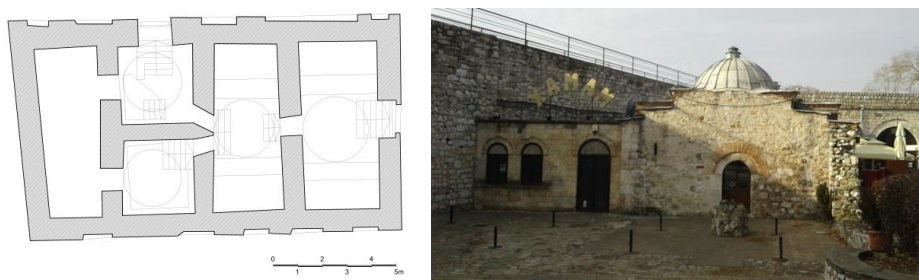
Floor plan (left) and photo (right) of Hammam in Vranje. Drawing A.M.Petronijević according to [1], photo [9]
